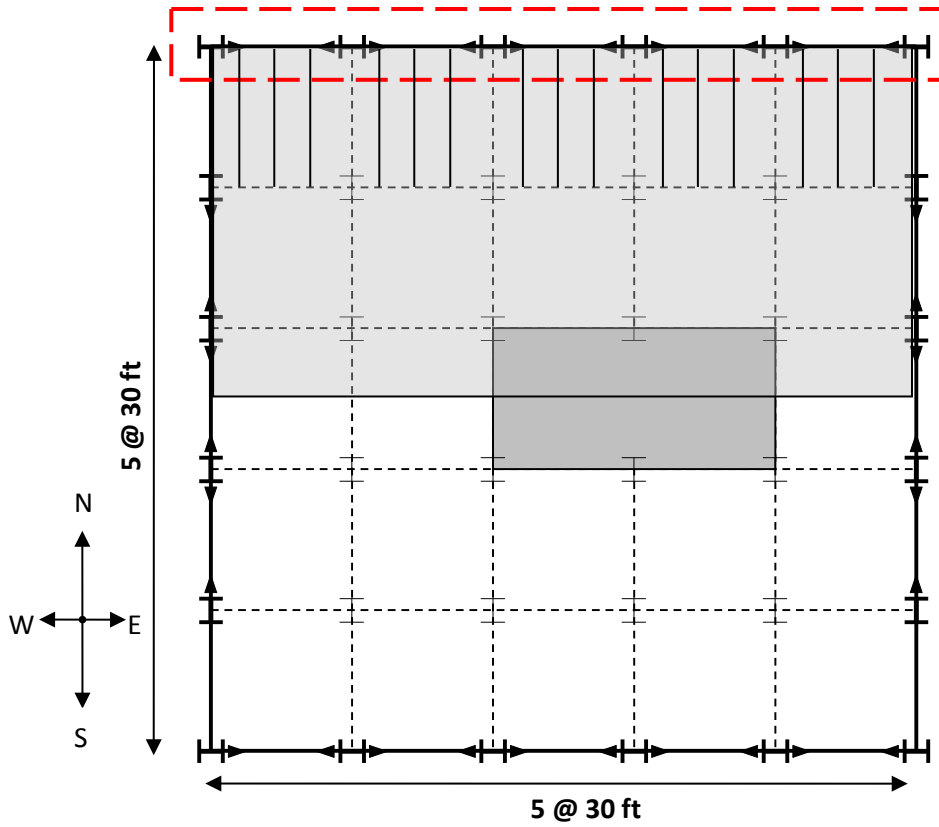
Typical Plan Configuration for SMF Archetypes
